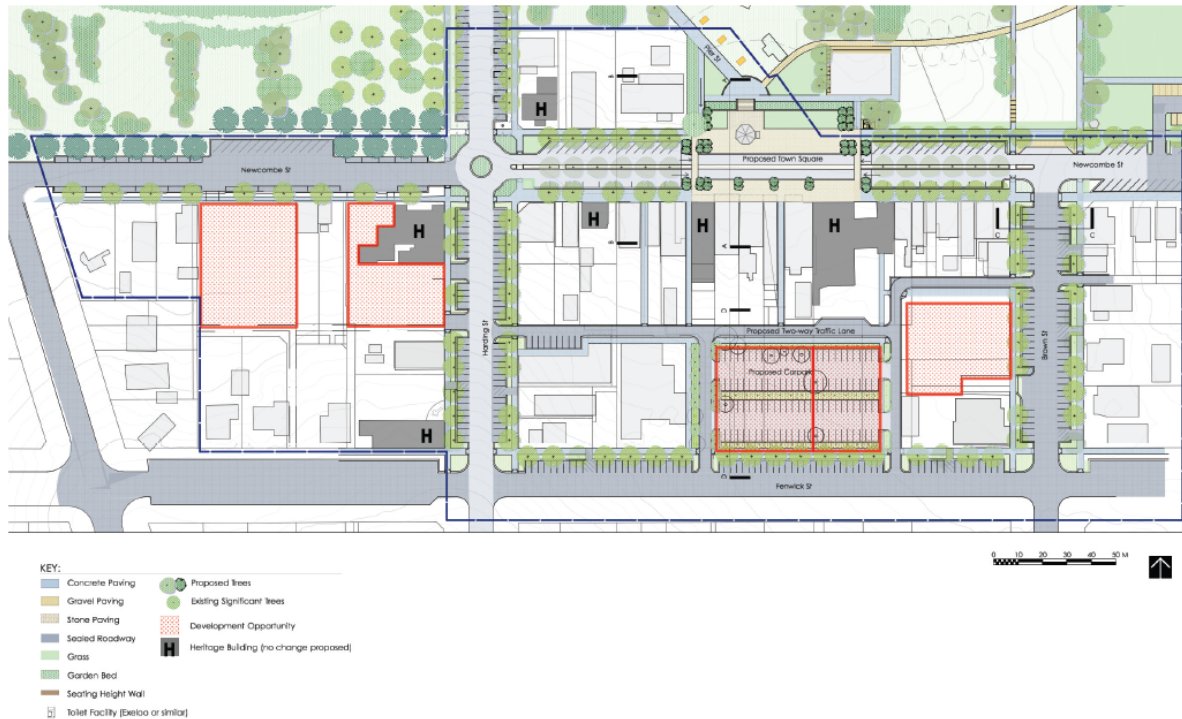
Portarlington Town Centre UDF - Public Realm Concept Plan.
